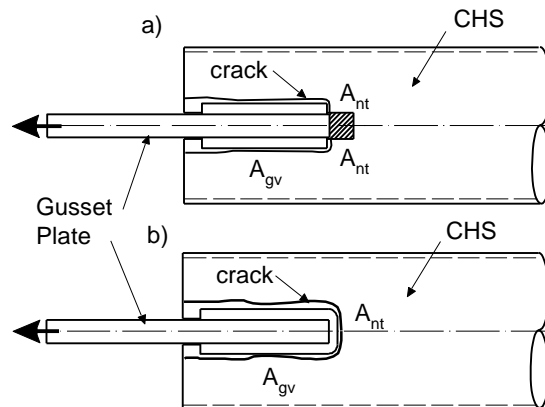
Gusset plate-to-slotted CHS joints: Tear out (TO) failure with a) longitudinal welds only and b) with longitudinal welds plus a weld return
